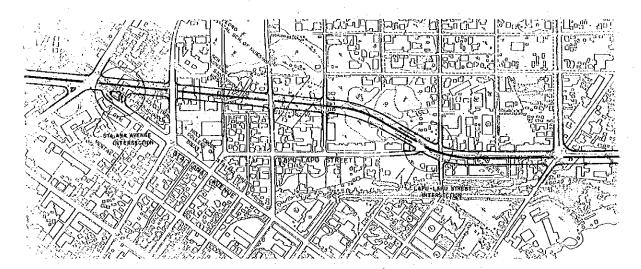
Alternative Route (6-lane Road: Sta. Ana Ave.—Lapu-Lapu St. Section)
